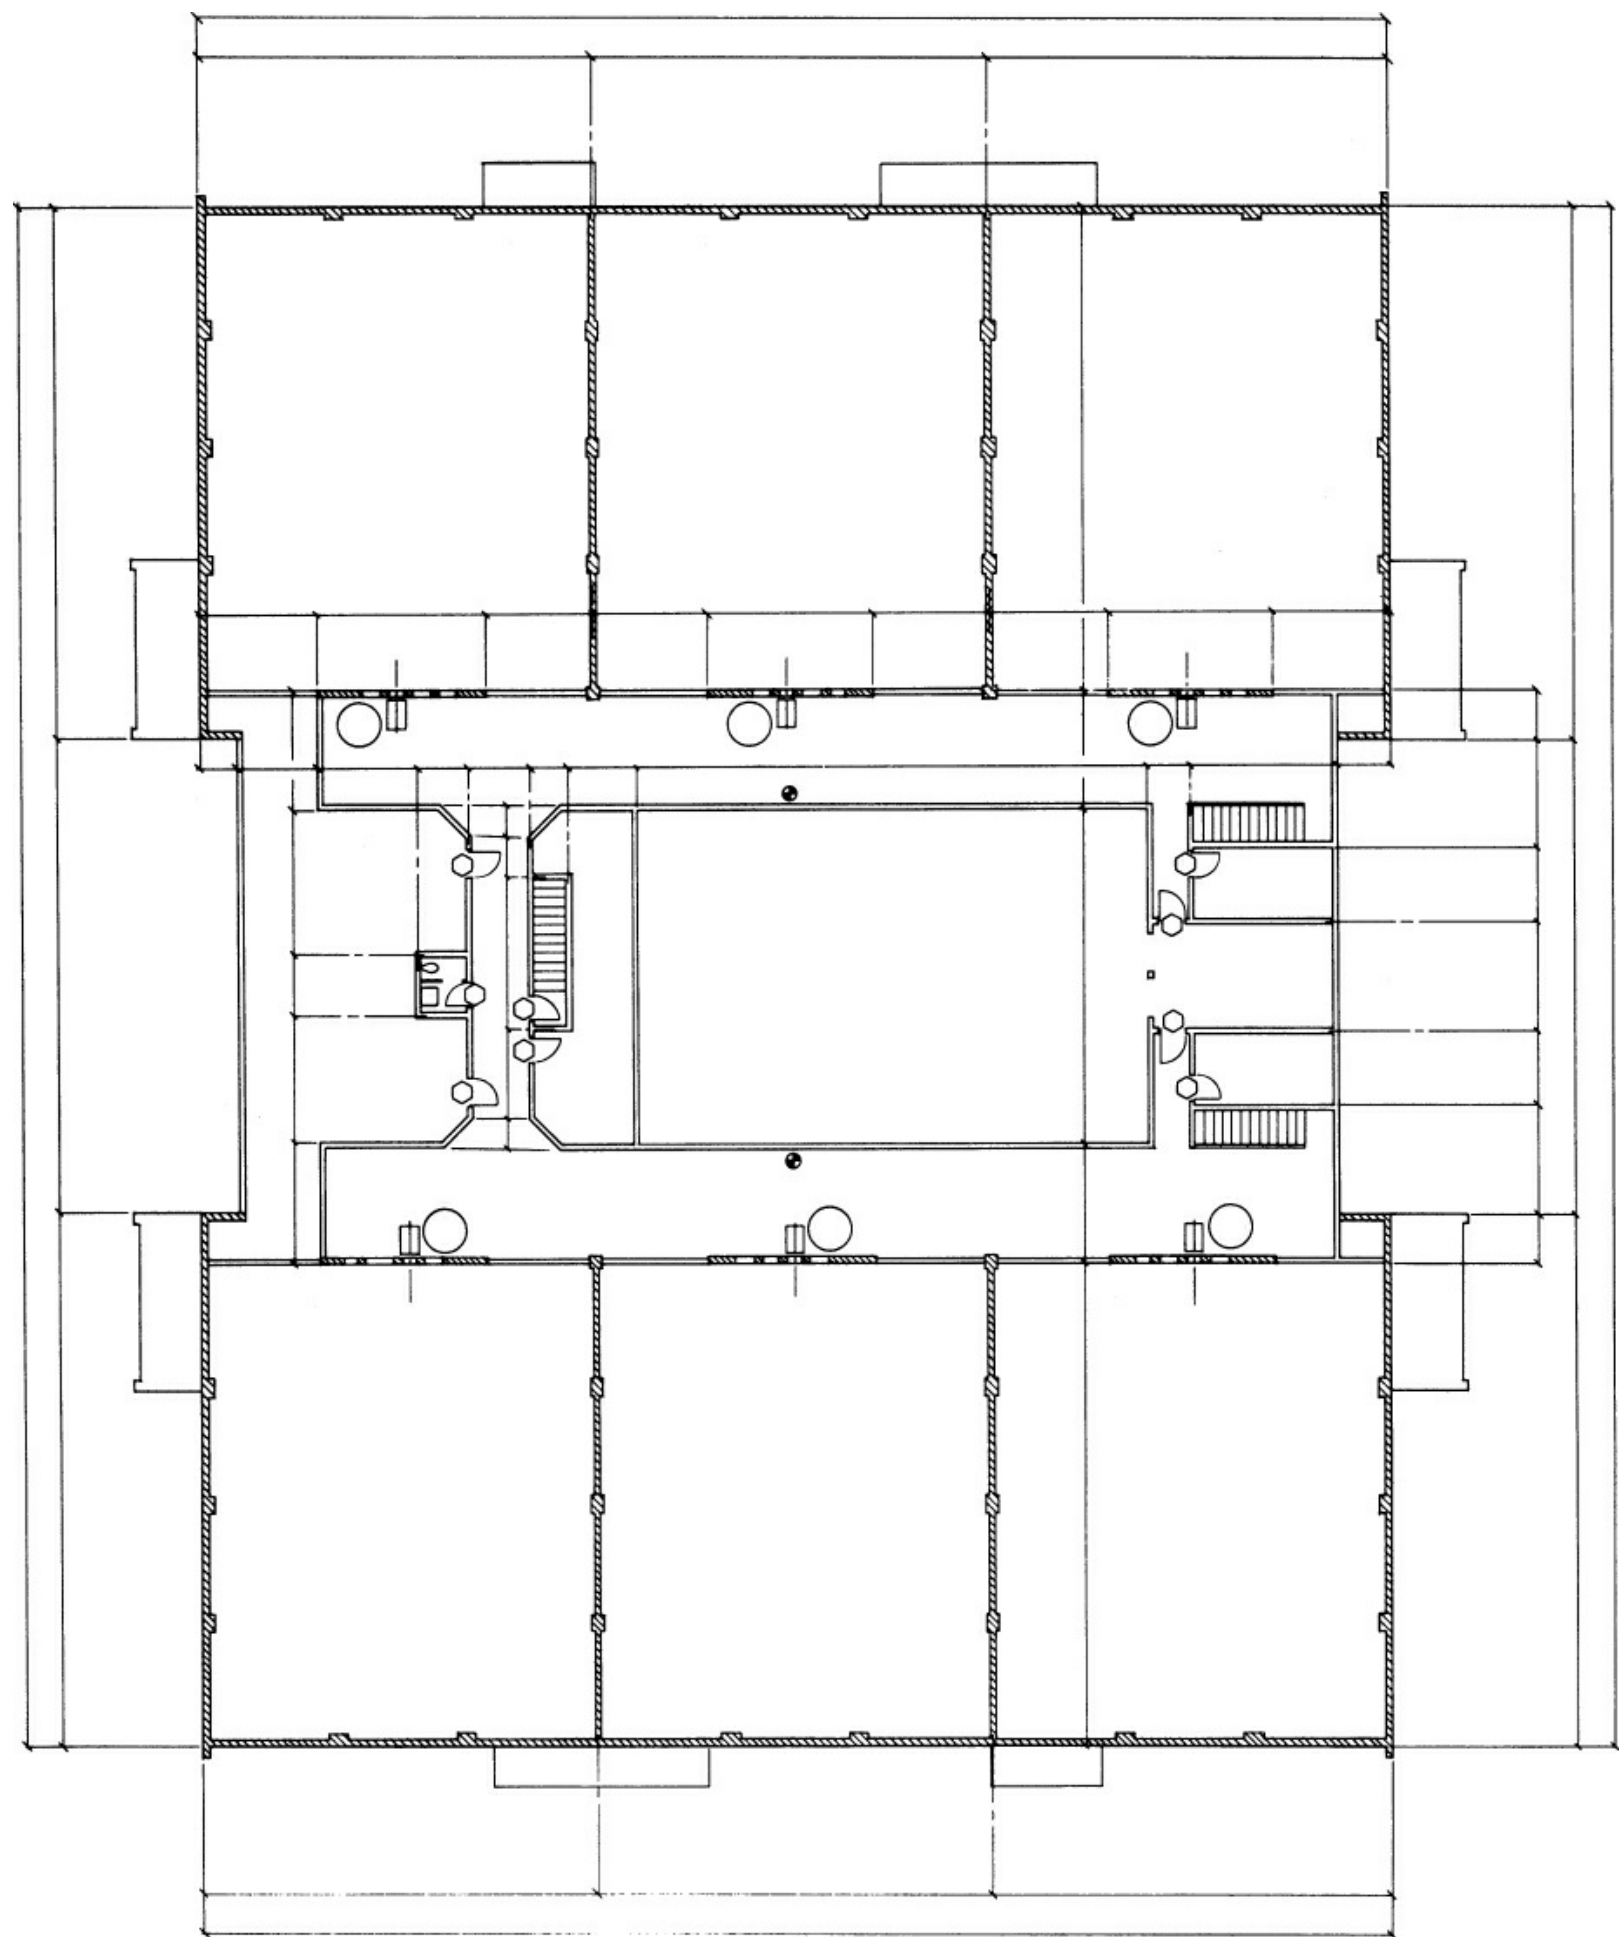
Clay Theater—Stage II: Working drawing—upper...floor plan.
